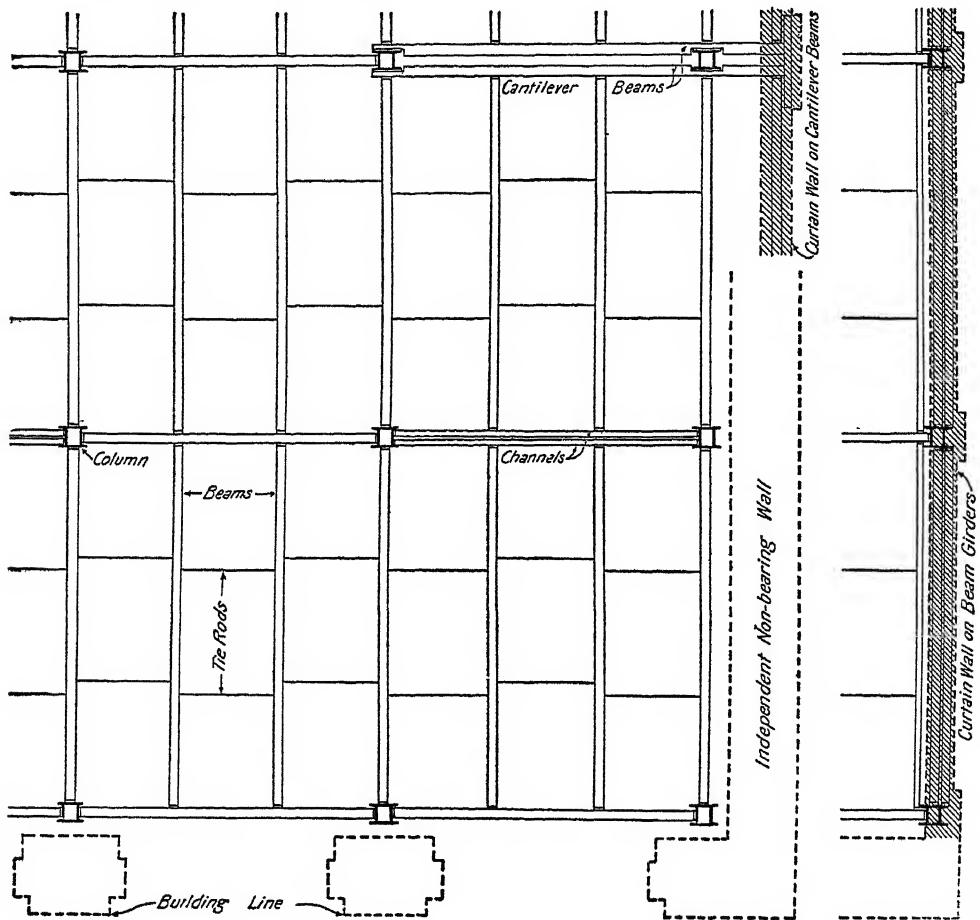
FLOOR PLANS OF TYPICAL SKELETON CAGE.
